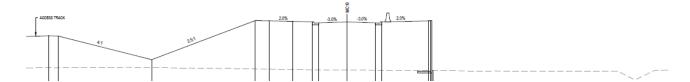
Indicative typical cross-section of alignment near East Hills Railway bridge
